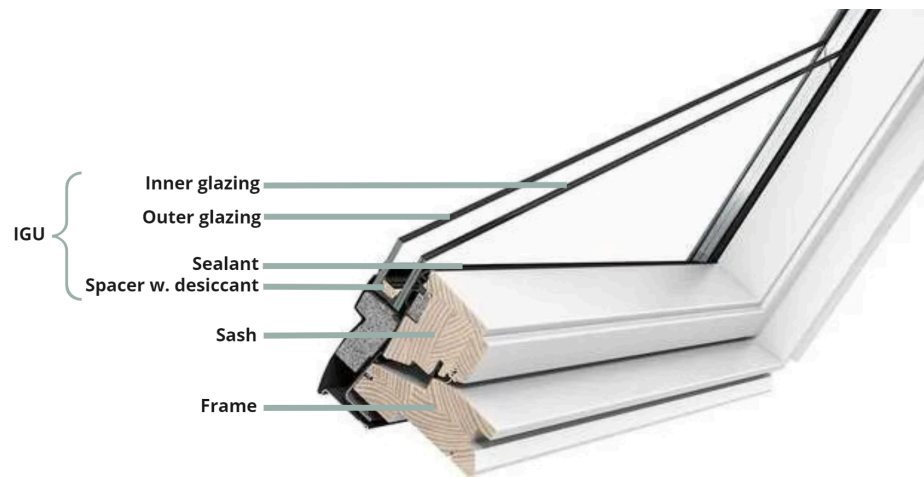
Cross section of a VELUX roof window (Roofgiant, n.d.)
